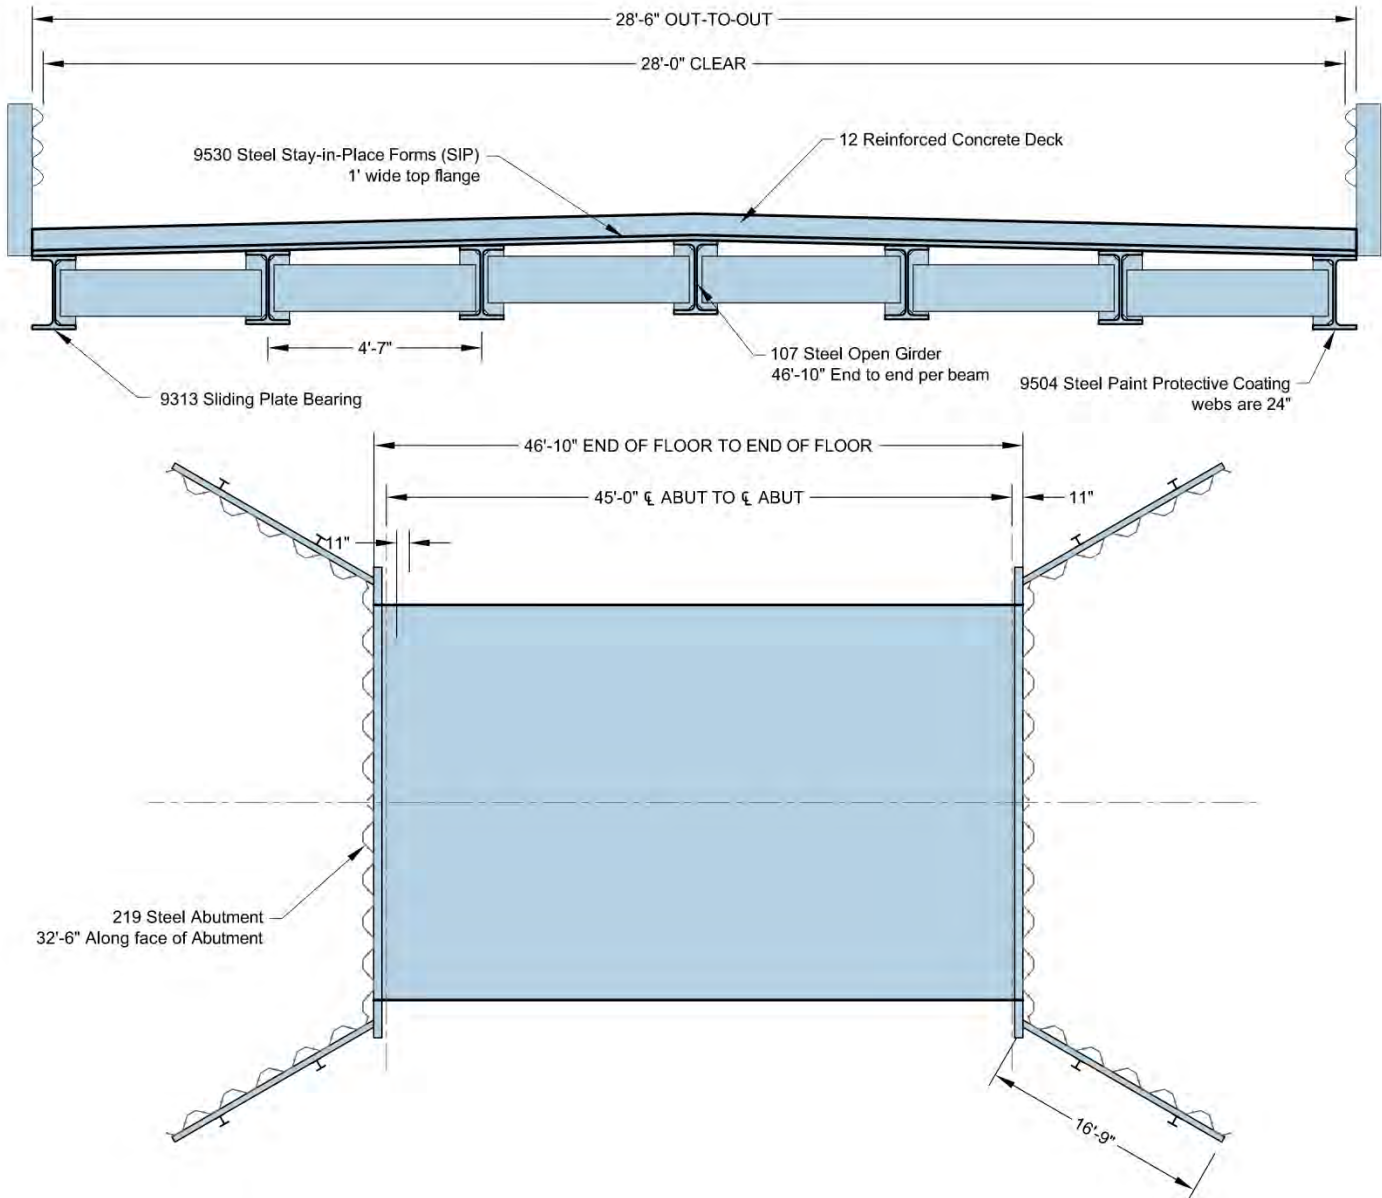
EI-24.8- 2: Plan view of simple span steel girder bridge
